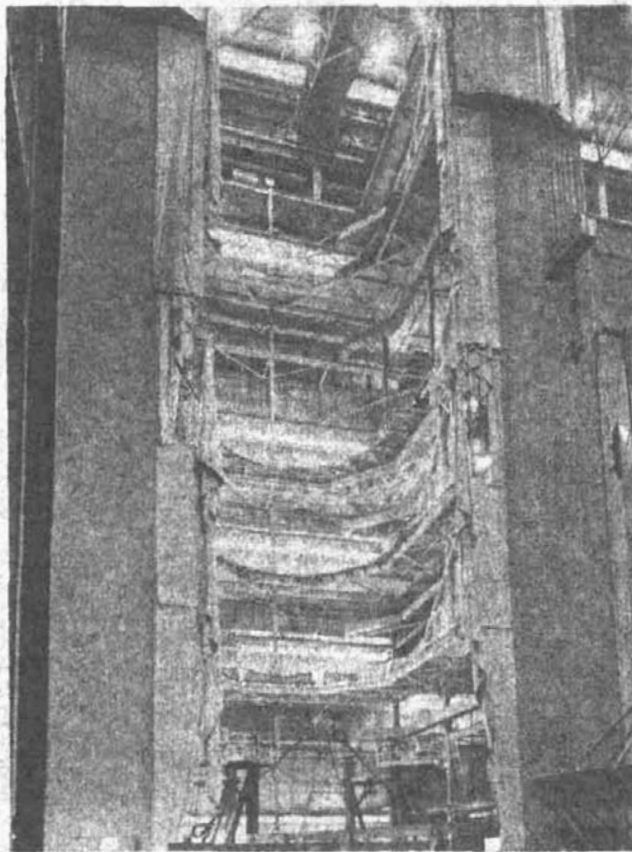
FINAL ASSEMBLY POSITION IN THE VERTICAL ASSEMBLY BUILDING
